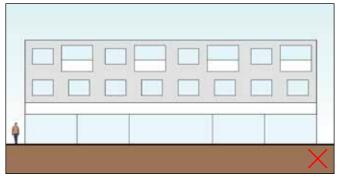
How not to do it: the ground floor and upper floors do not relate to one another architecturally
